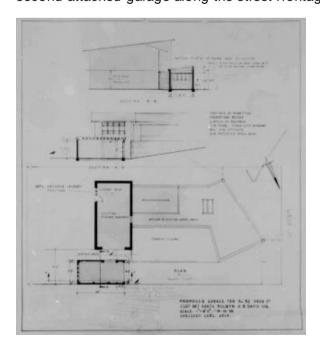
Working drawing dated 1953 for proposed alterations to 32 Ursa Street North Balwyn including a free-standing garage and basement. (Source: BP 6327, 13110)
